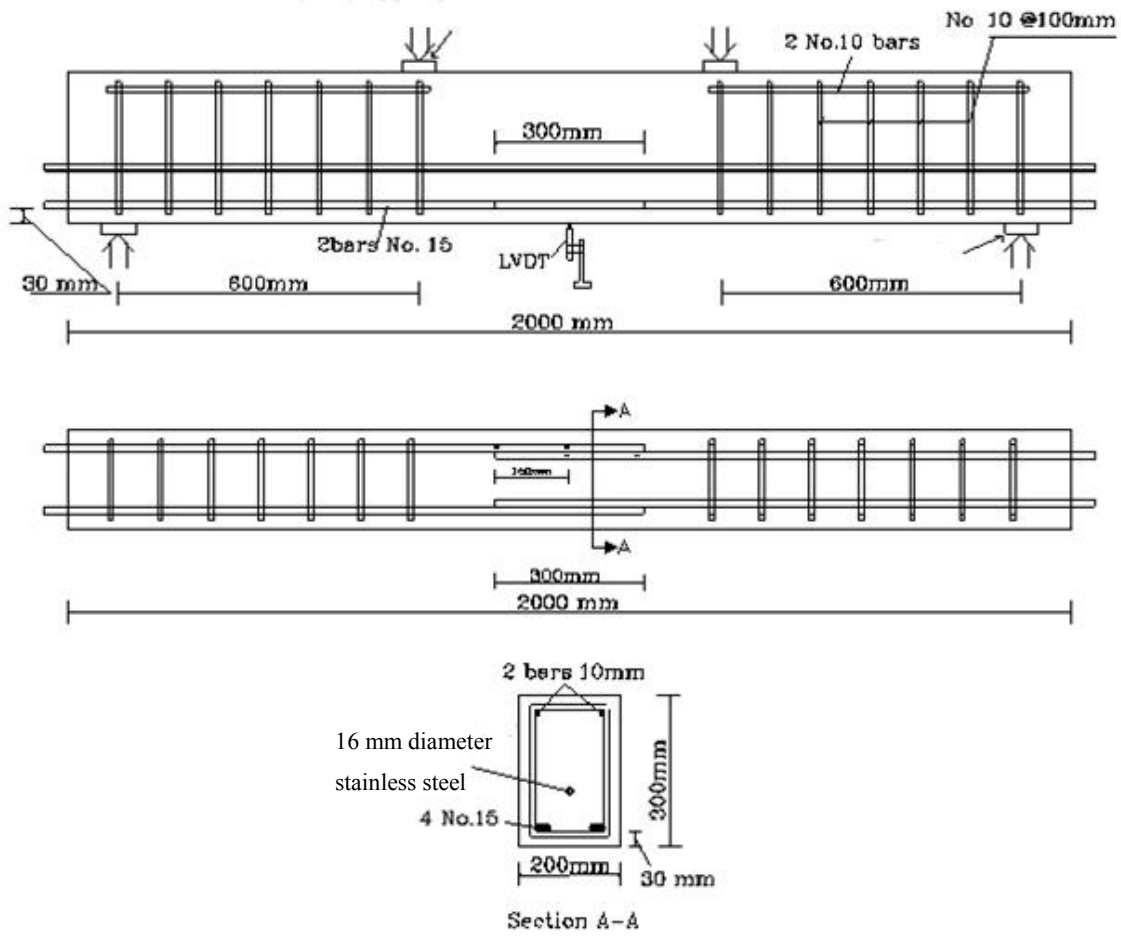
Beam configuration and reinforcement details ( $c/d = 2.0$ )
